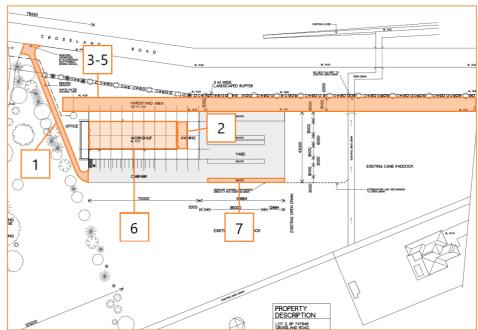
Site plan containing nominated activity locations. Source: Brazier Motti
